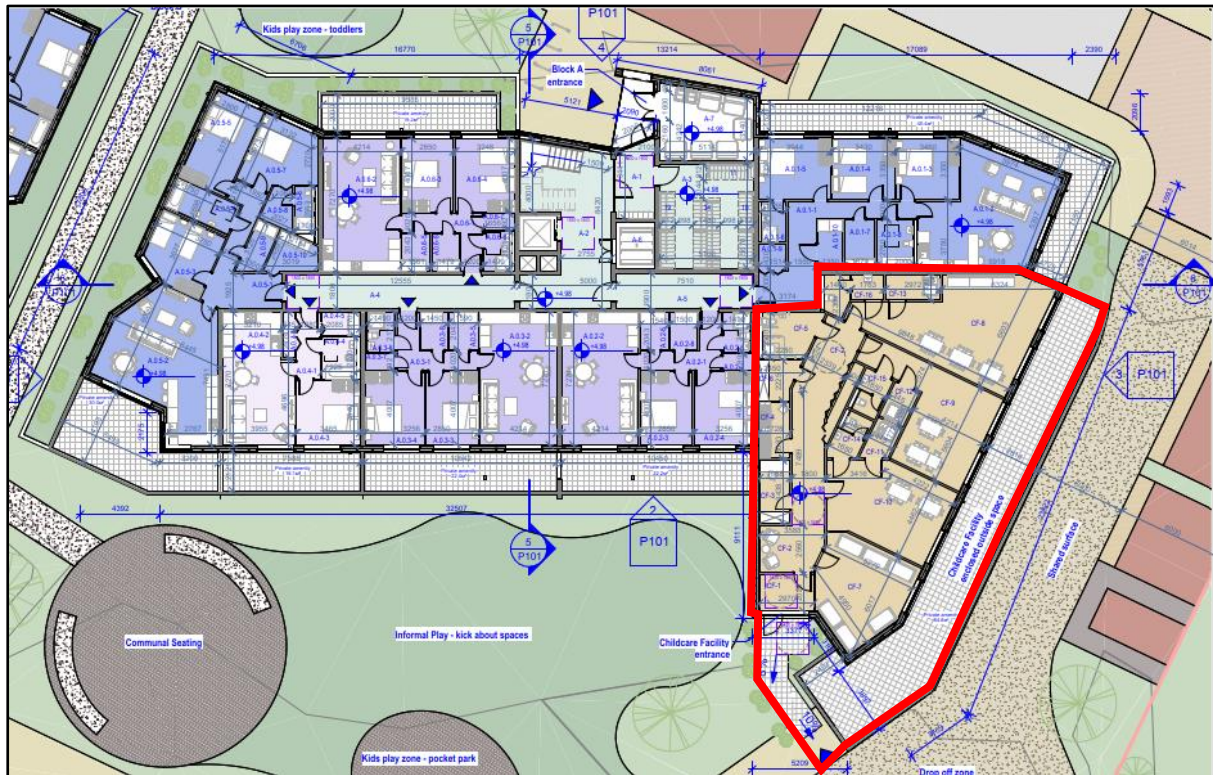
Extract from Douglas Wallace Drawing No. P100 – Block A Ground Floor Plan. Creche outlined in red
